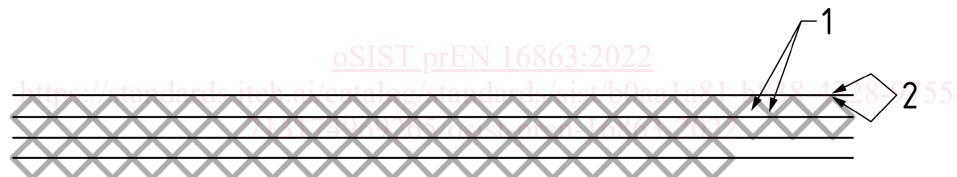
Type A - Alveolar reflective insulation comprising an inner shaped foam layers combined with aluminium coated foils creating triangular shaped cavities similar to a honeycomb structure
